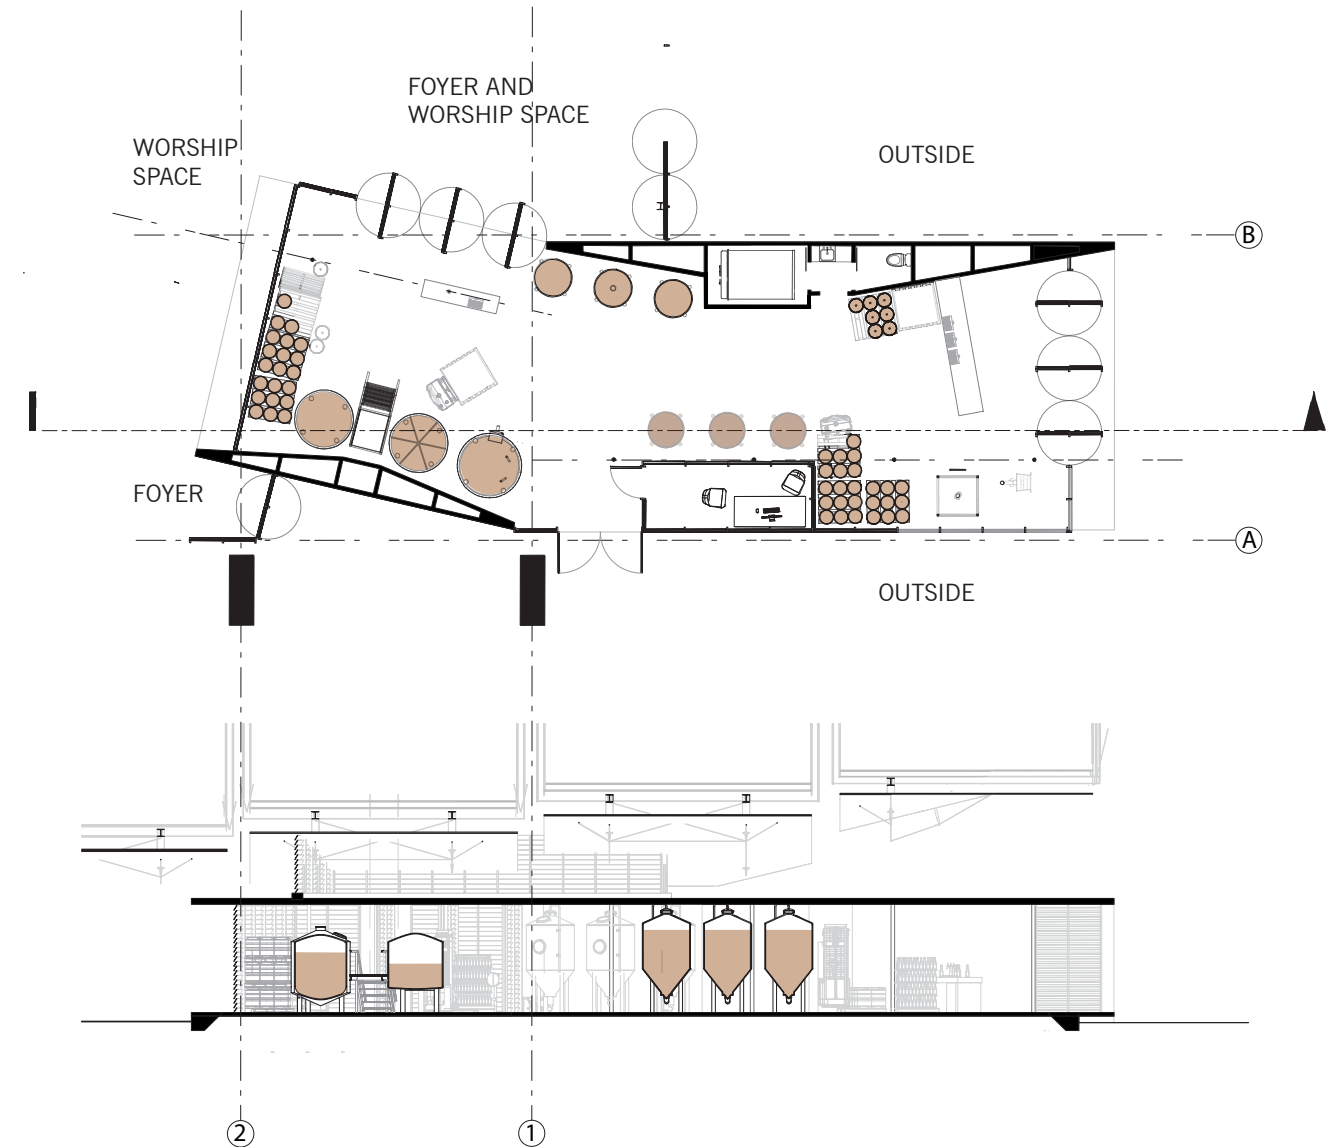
Final Design Brewery- Plan + Section, By Author
